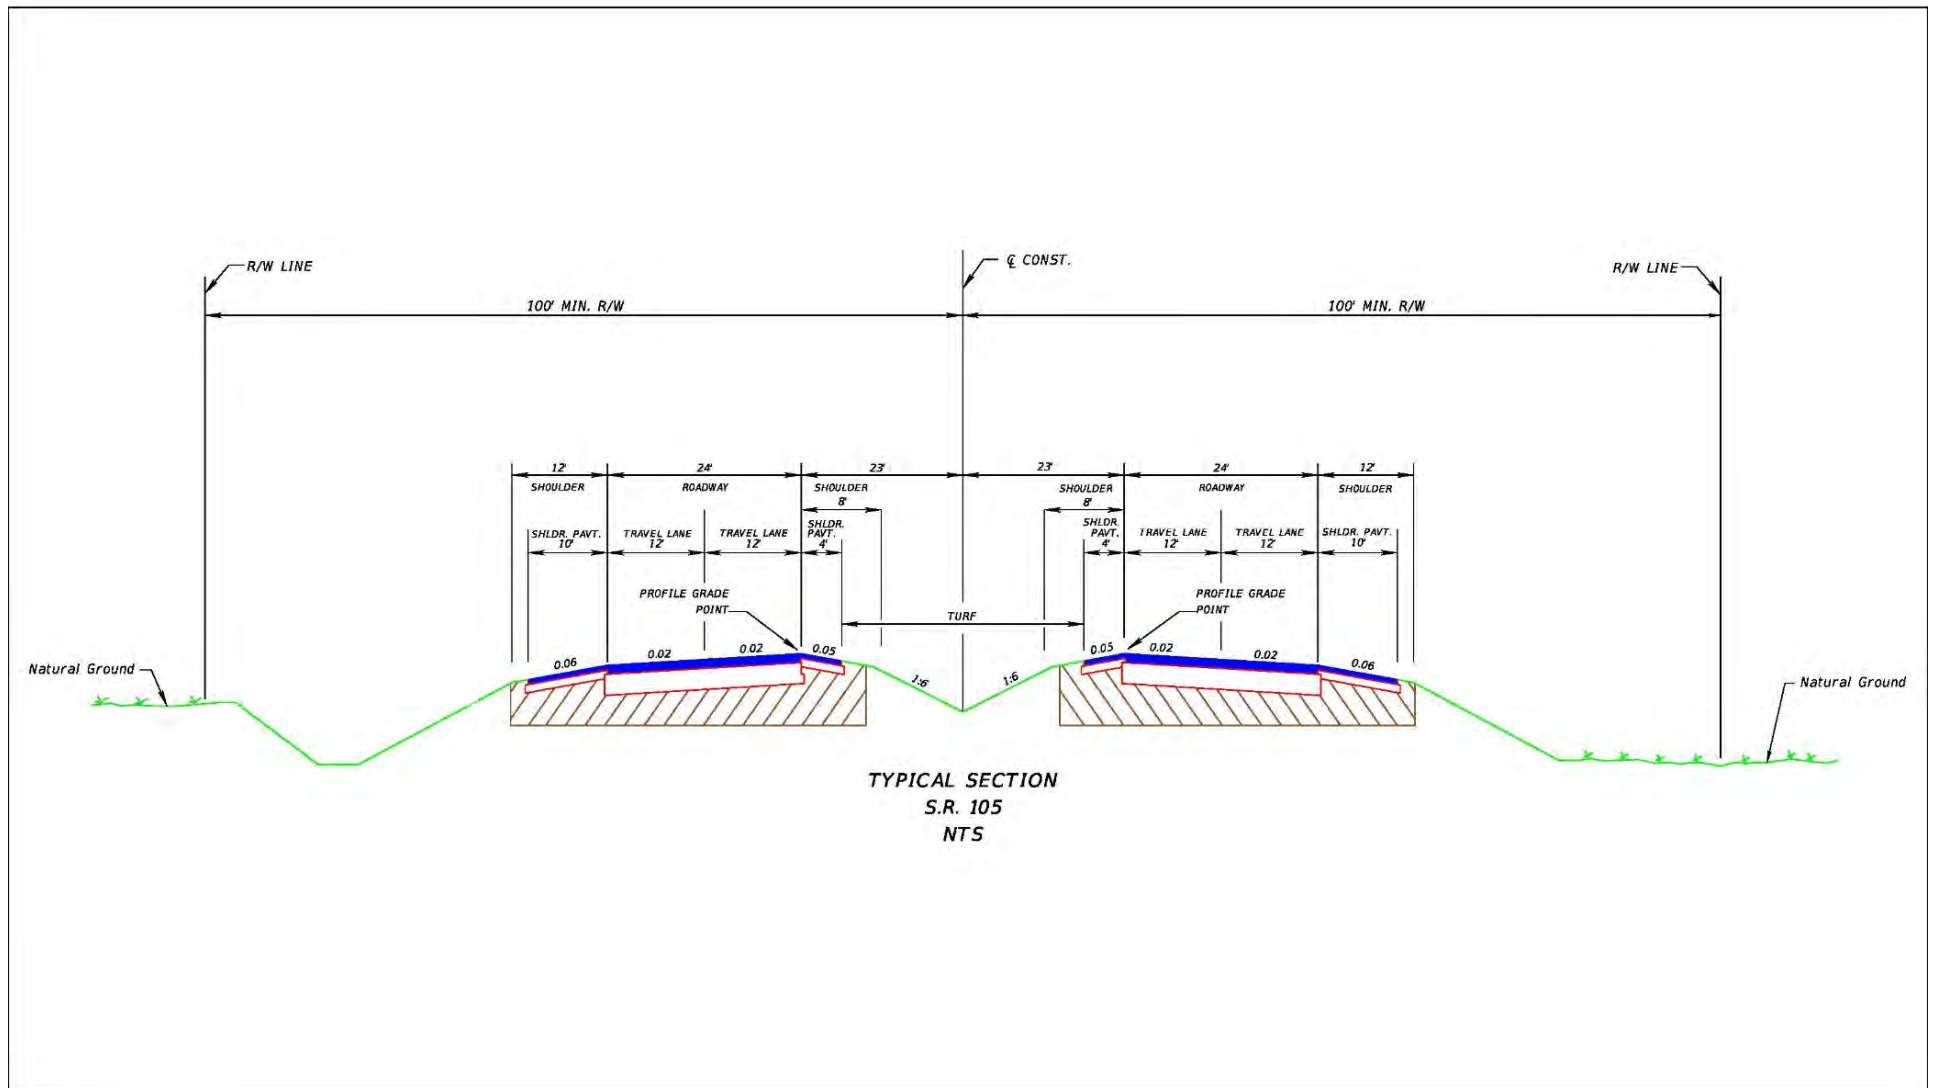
S.R. 105 Existing Typical Section (4-Lane Divided)
